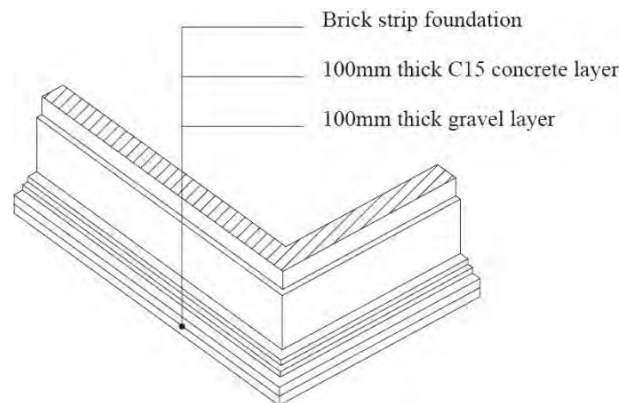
Brick strip foundation (Image source: Professor Zhou Qi's studio at the School of Architecture, Southeast University)
